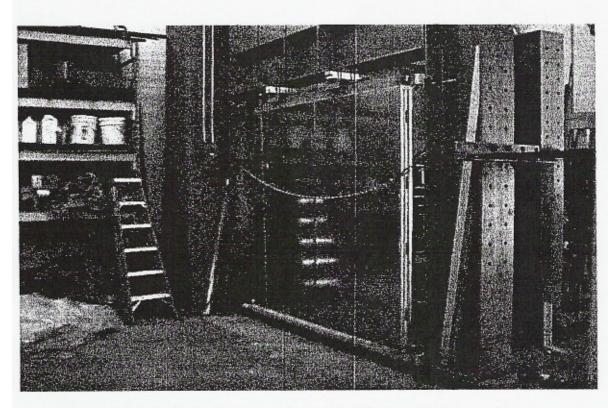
Test Setup for Racking Loading 8' Galv.-Galv. Panel
